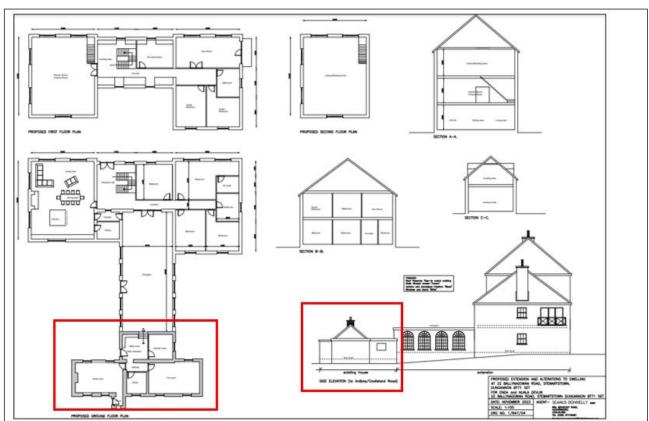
Proposed floor plans and west side elevation of the resultant dwelling with the existing dwelling identified by red box.
